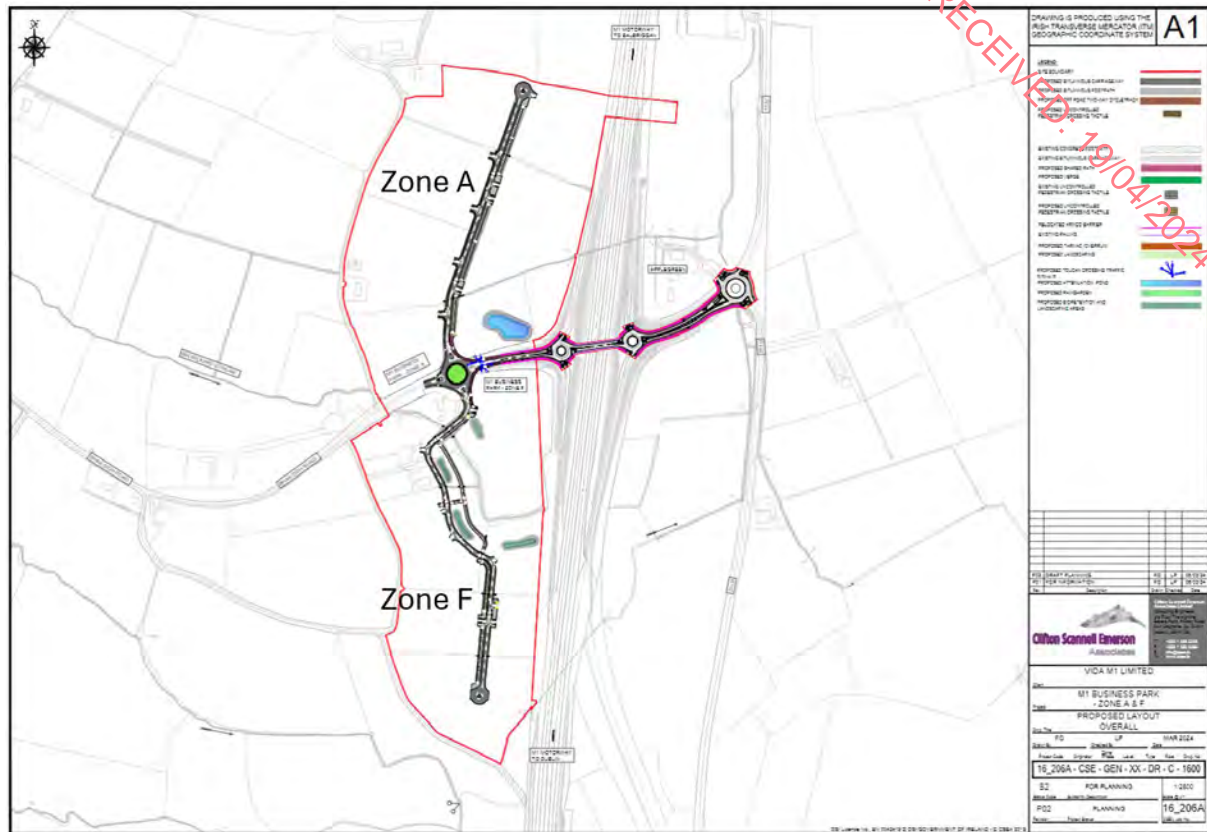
Proposed Development Layout as per attached Drawings 16_206A-CSE-GEN-XX-DR-C-1600 to 1606
